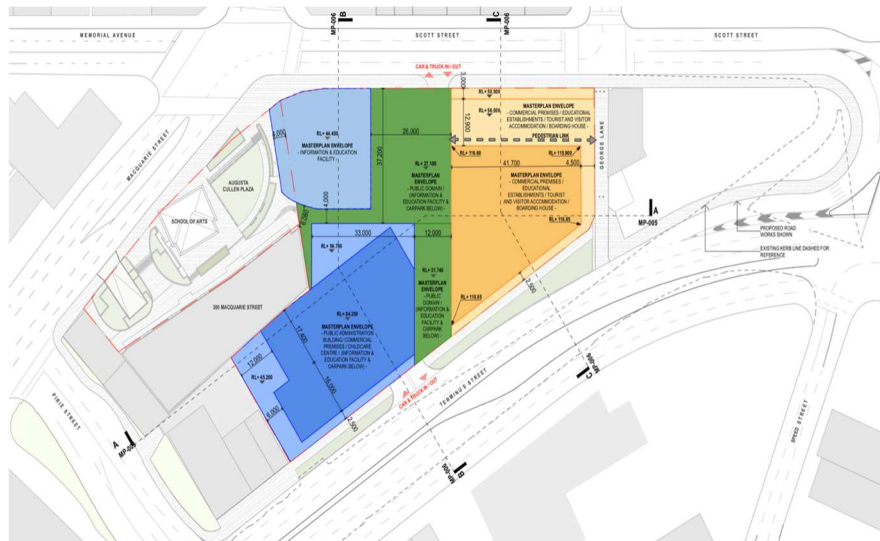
Liverpool Civic Place Master Plan site. (Source: FJMT Architects)
